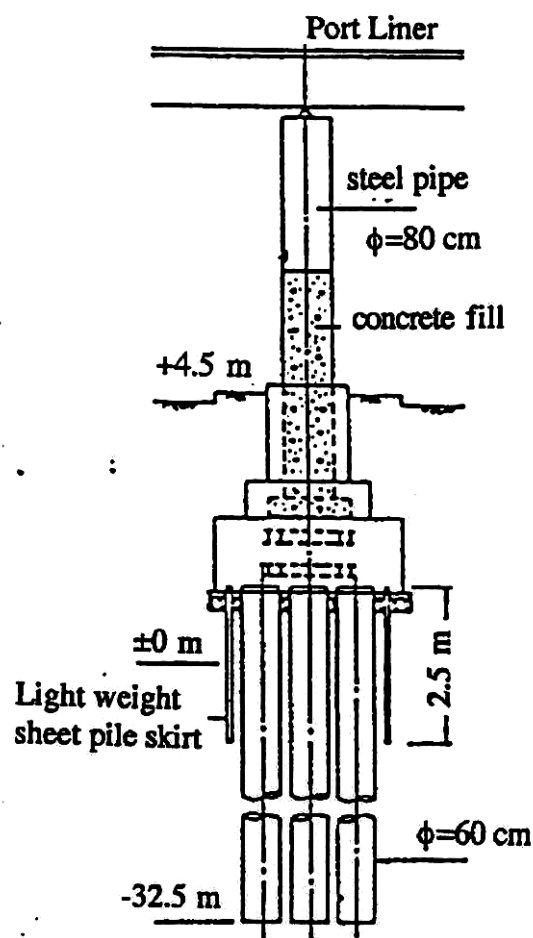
Foundation of the port liner railway, after Watanabe (1981)
